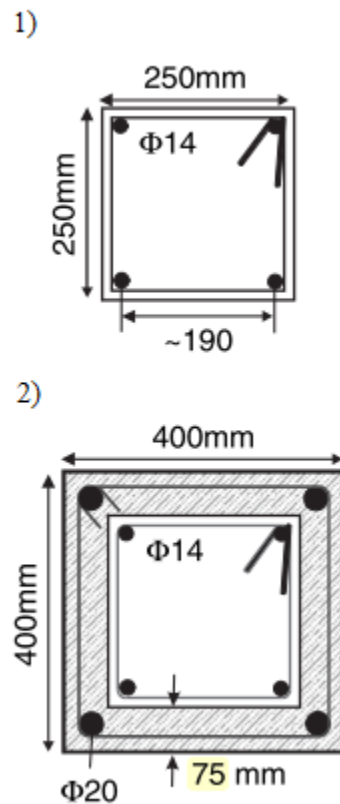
Cross section of the original column (1) and the retrofitted with the RC jacket (2) (Bousias et al., 2007)
